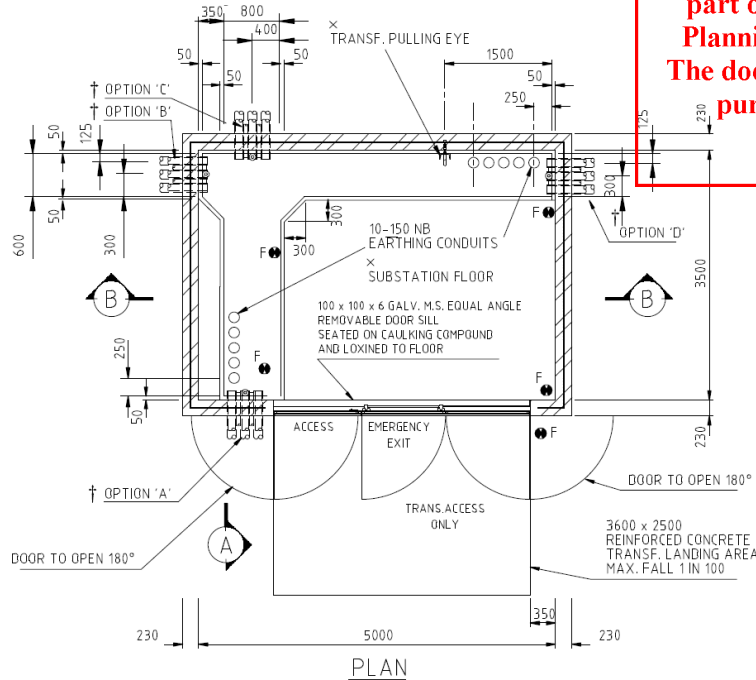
UE INDOOR SUBSTATION PLAN
